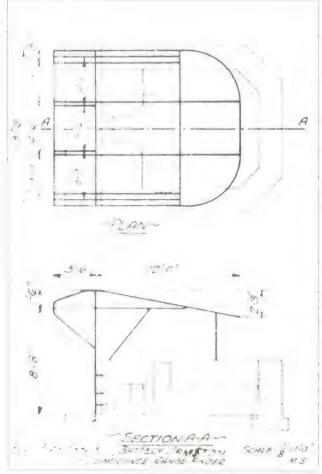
Plan and sections of cover over Battery Urmston's commander's station, 1921. In order to improve the targeting of enemy ships, a dedicated concrete structure was constructed between Battery Urmston's emplacements #4 and #5 for observation. The open station was fitted with a pipe frame and covered with canvas to provide some protection against the weather (Report of Completed Works, CDSG ePress).
